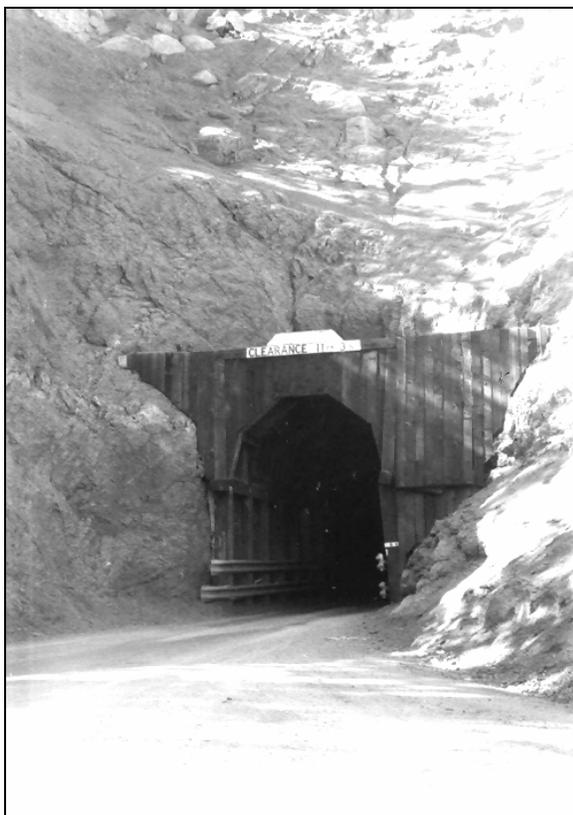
Built in the late 1890s for the Midland Terminal Railroad, the Little Ike or Waters Tunnel became an automobile tunnel on SH 67 after the route was abandoned by the railroad in 1949. Now bypassed by the highway, the one-lane tunnel features a wood portal and a timber lined interior. Source: OAHP, CHS: 1976.
